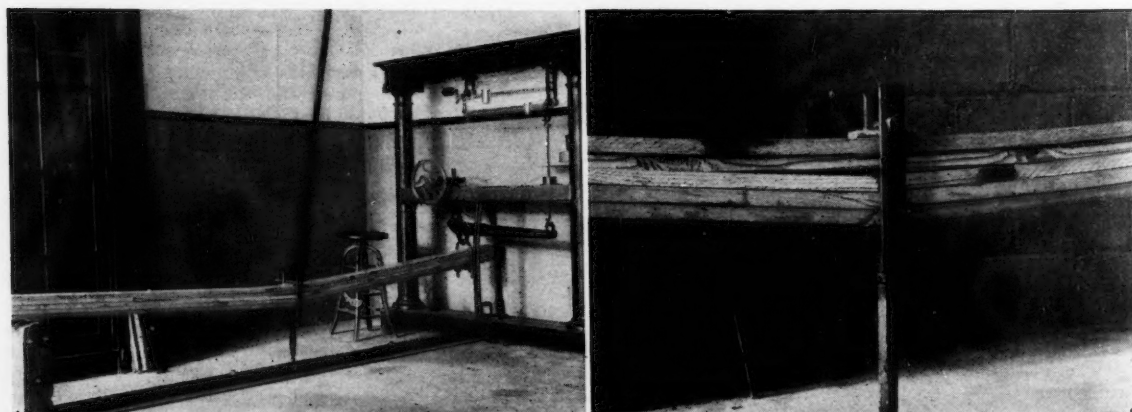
(Left) Testing apparatus with a fractured specimen in place. (Right) Close-up view showing failure of a glued specimen (No. 9)
